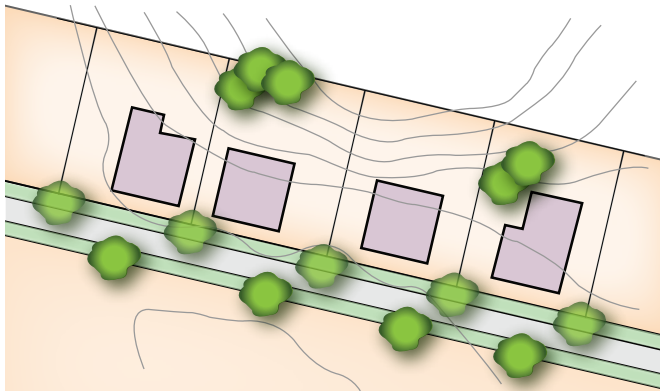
Building envelope sits below the ridgeline: Contour Plan
